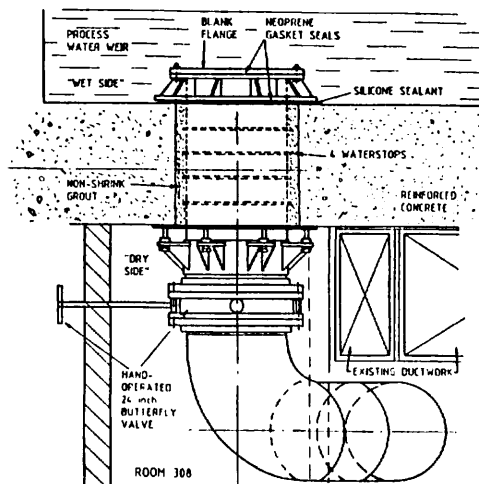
WEIR TAKE-OFF PIPING DETAILS.
